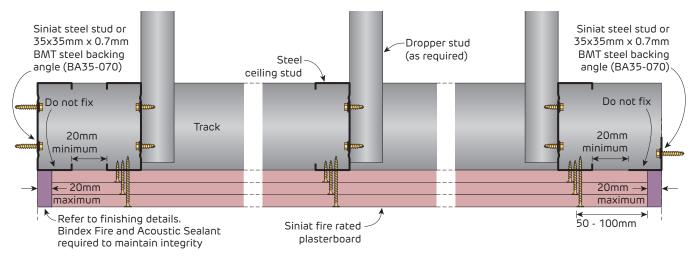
Stud Ceiling Type C1 - 2-way Plenum Braced Elevation
